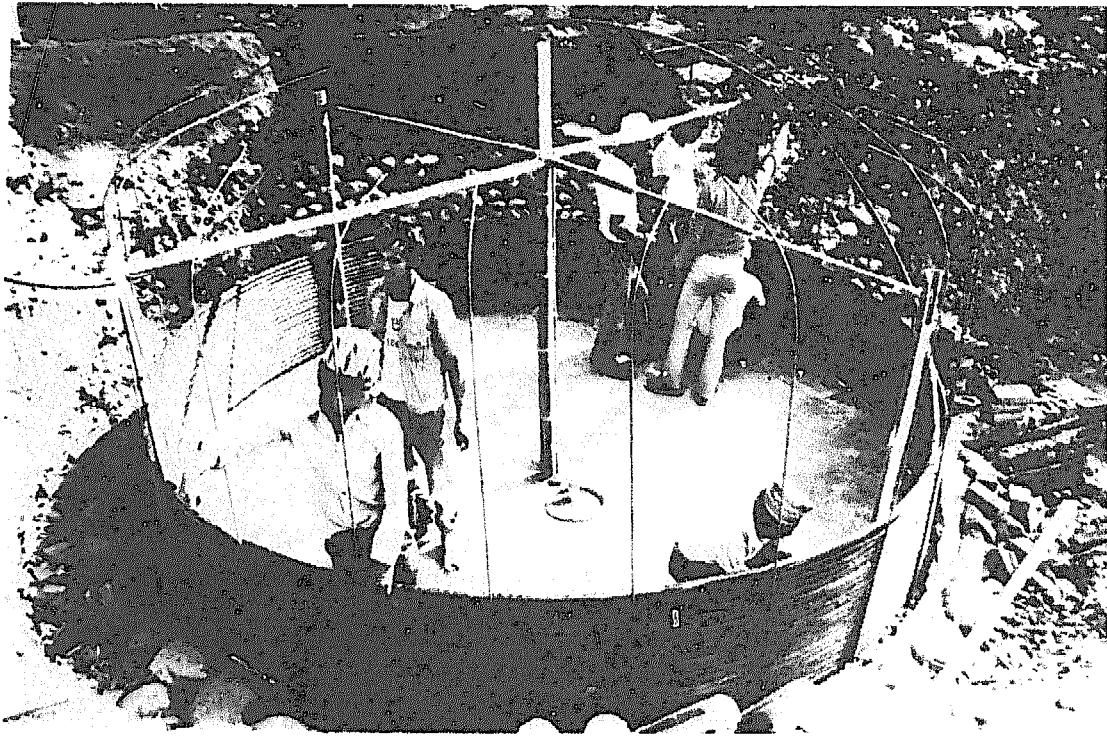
Construction of ferrocement tank using plastic pipe as the inside mould, Nepal, 1986 (photo Heynen)
